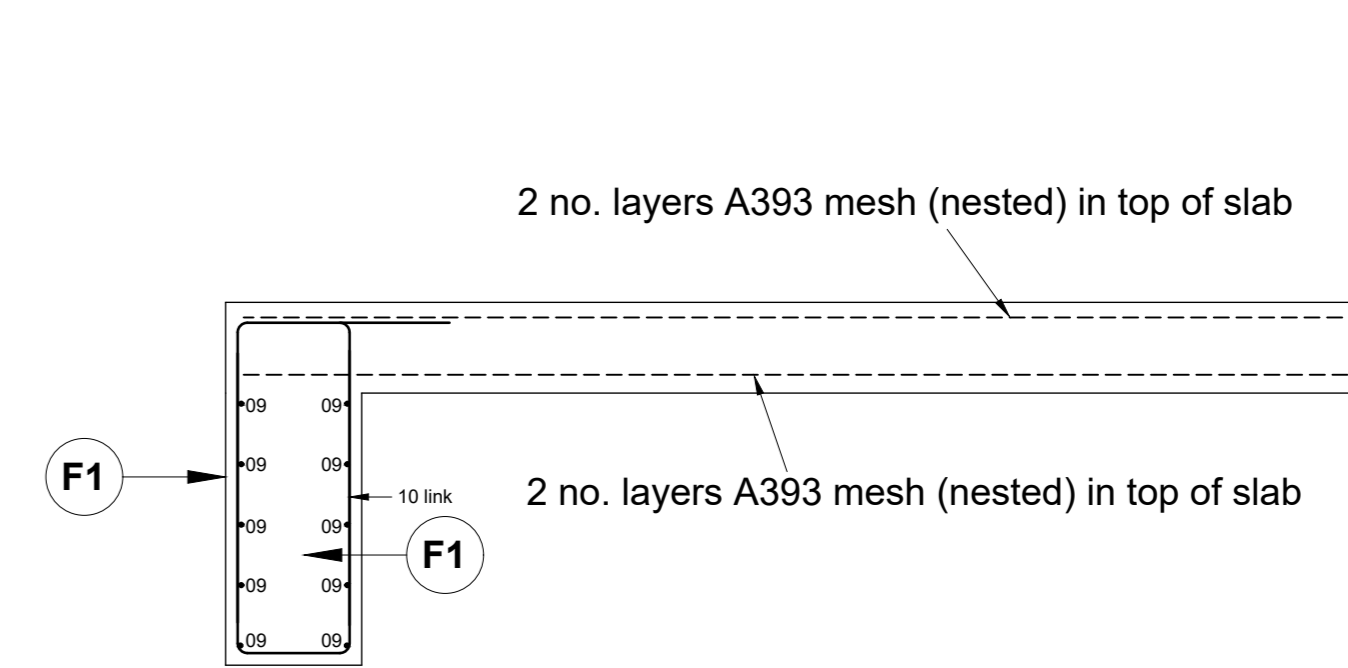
DETAIL C - PLAN ON RC SLAB AT LOADING LEVEL SHOWING REINFORCEMENT DETAILS, 1:50 (+6.13m level)
